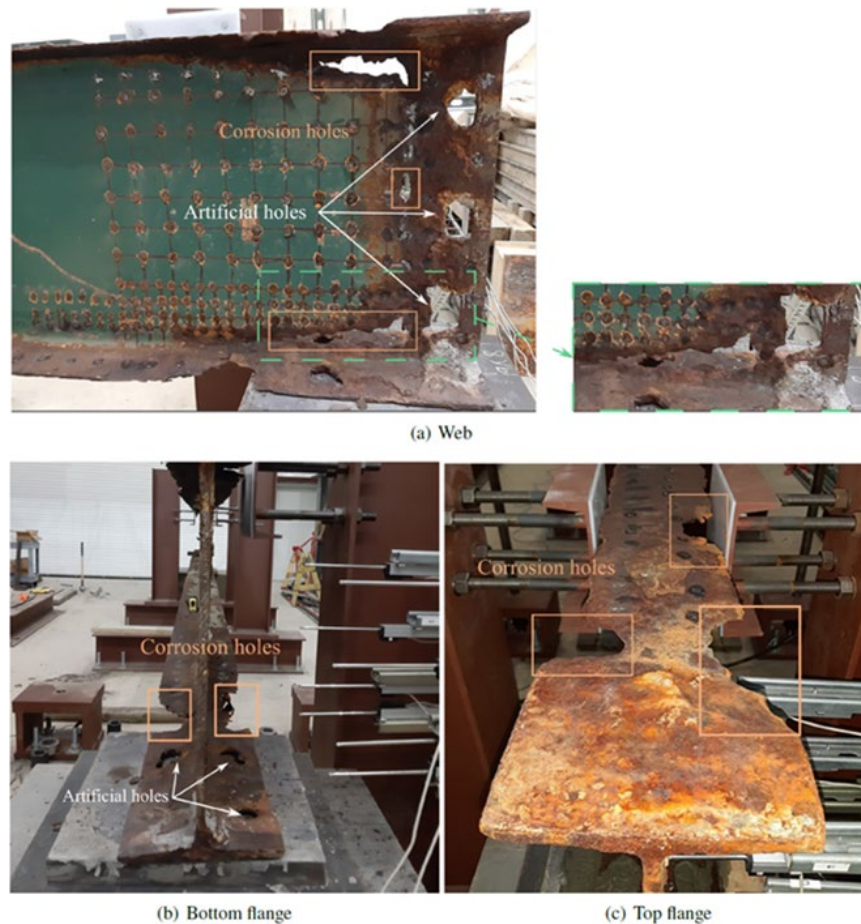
21WF73 girder with corrosion holes from a Massachusetts bridge
